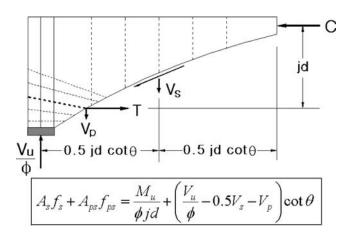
Shear demands on longitudinal reinforcement at end of prestressed girder.
